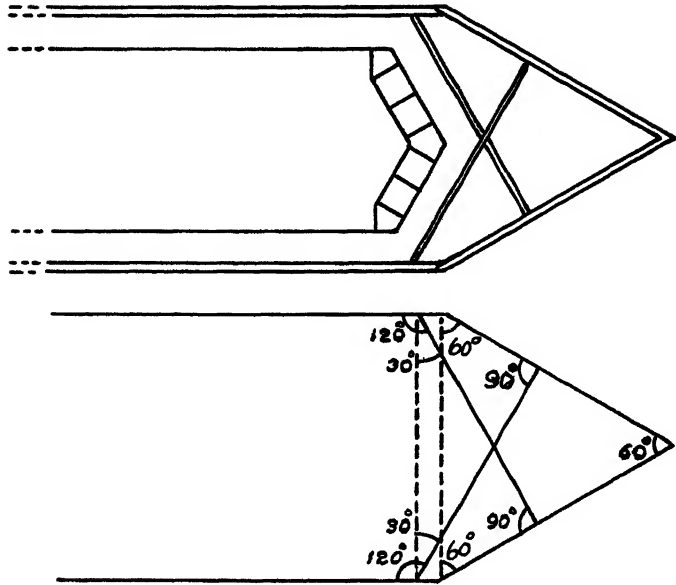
FRAMING OF PILEWORK OF BRIDGE (RECONSTRUCTED)
